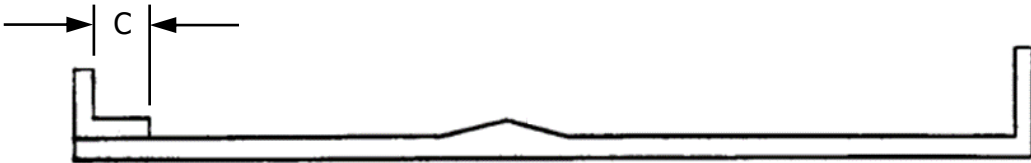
Cross-section view of a bridge deck with multiple median barriers.
